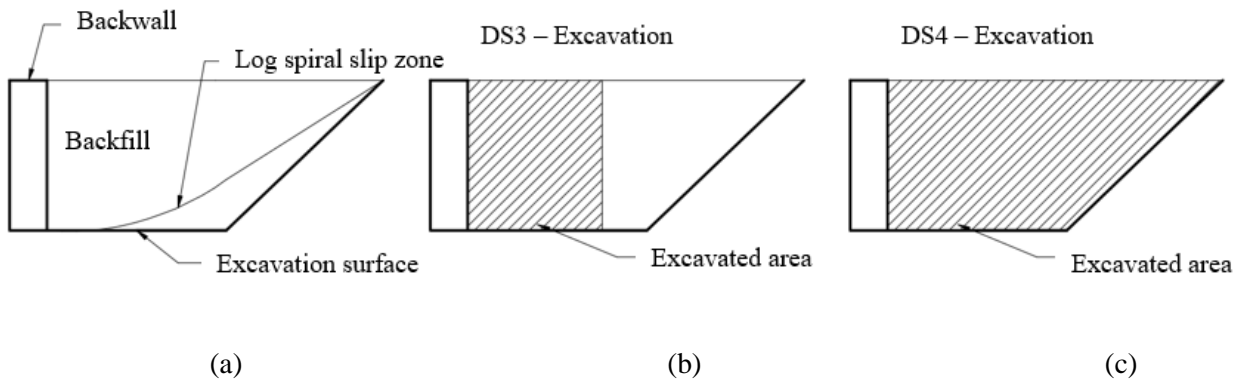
Excavation required for backwall repairs showing: (a) simplified excavation surface, (b) excavated area for DS3, and (c) excavated area for DS4
